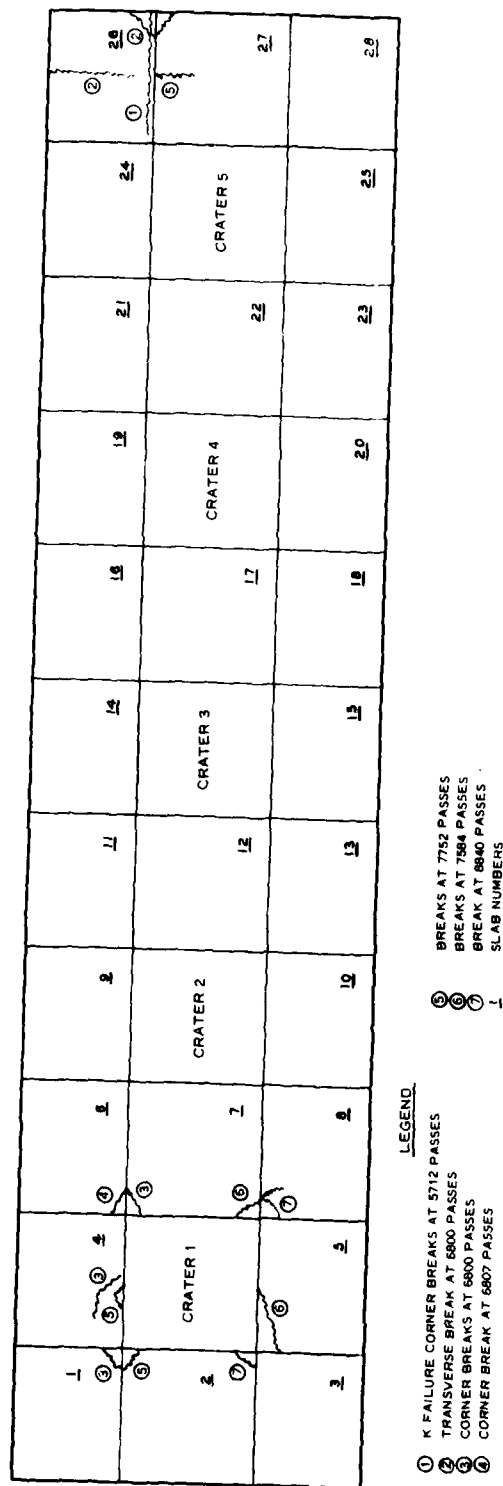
Cracks in concrete prior to asphalt overlay
